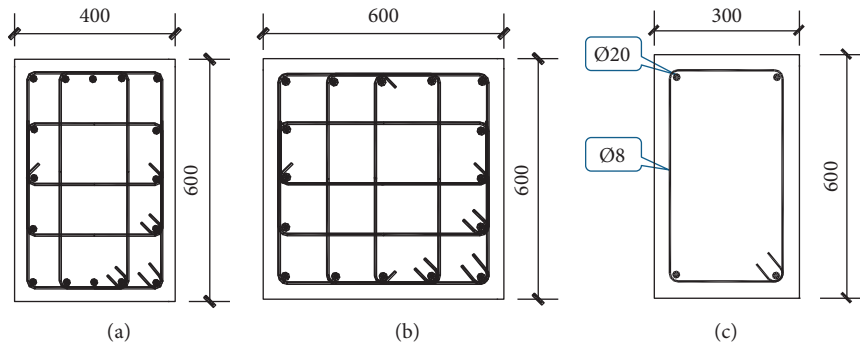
RC member sections and reinforcement configurations. (a) RC column, (b) RC corner column, and (c) RC beam.
